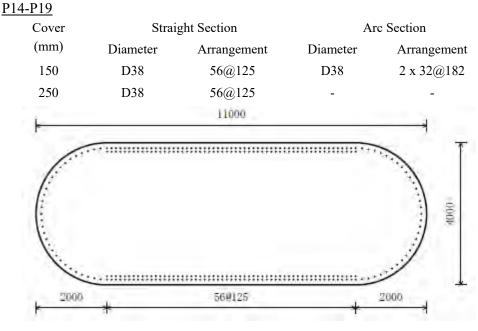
Rebar Arrangement (Main Reinforcement)
